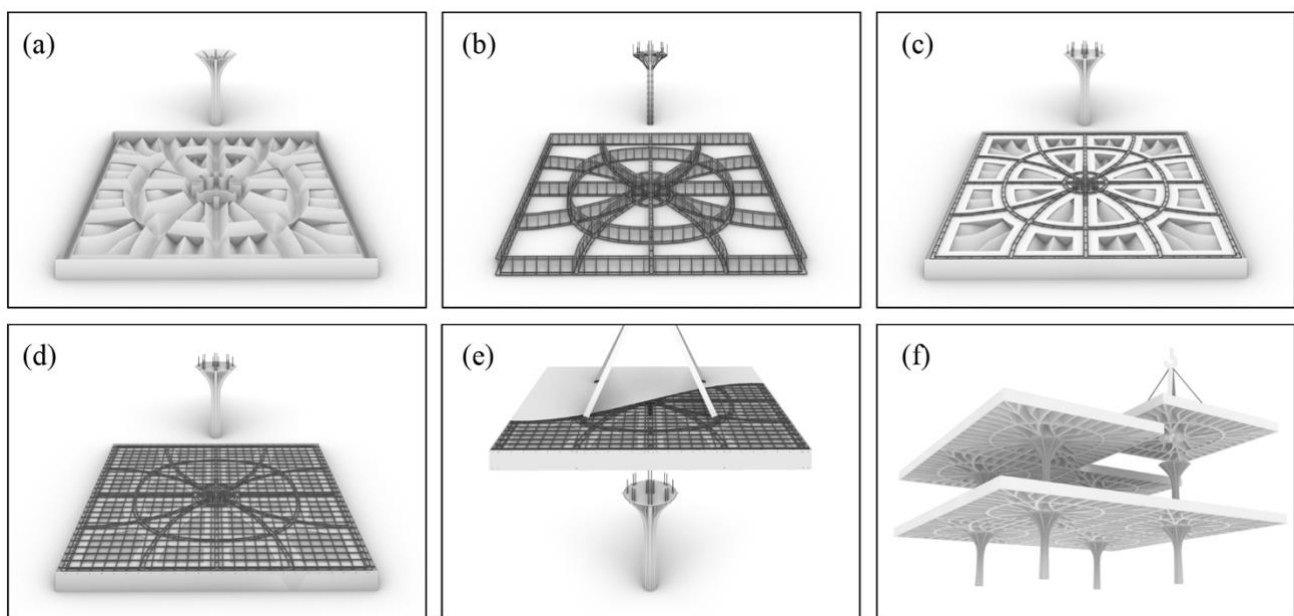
The fabrication processes of lamella-inspired column slab system (a) 3DCP stay-in-place formwork (b) Reinforcement cages (c) Inserting reinforcement cages in the formwork and casting the main ribs (d) Installing reinforcement mesh on the slab (e) Lifting, assembling, and casting the slab (f) An outlook for future constructions
